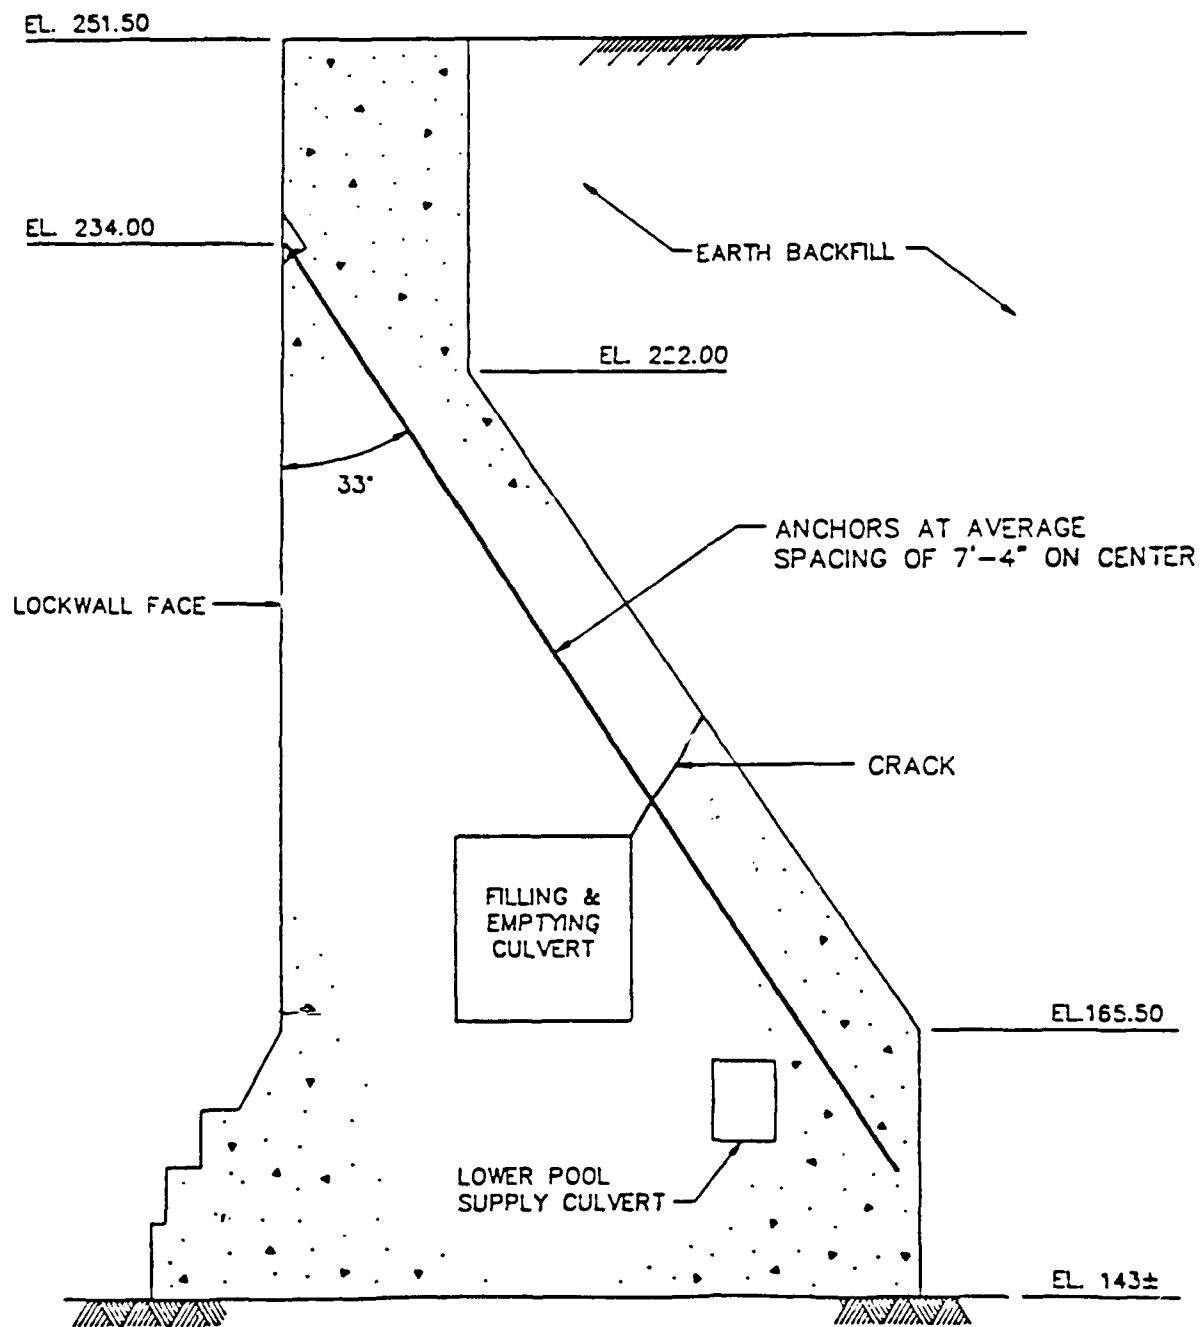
Typical section through south wall chamber monoliths (not to scale)
